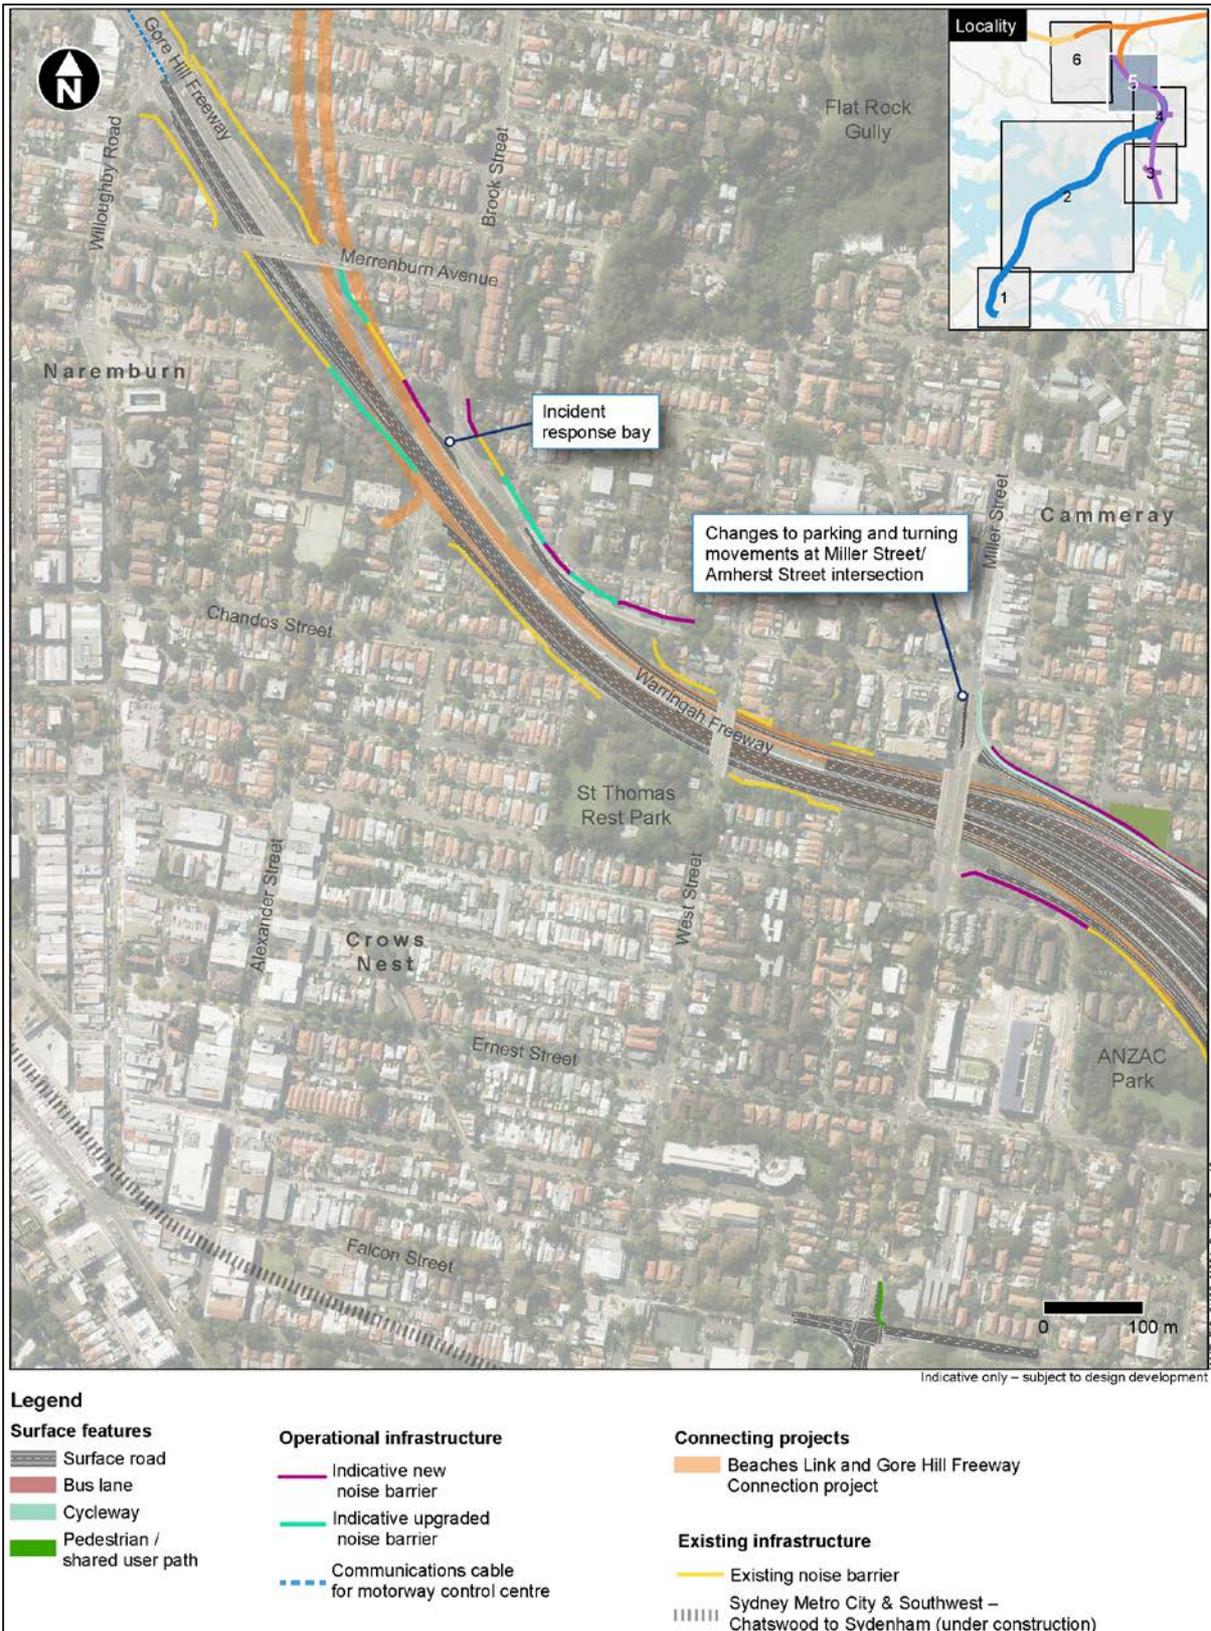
| Project Layout: Surface road changes to Miller St (Source: EIS)
